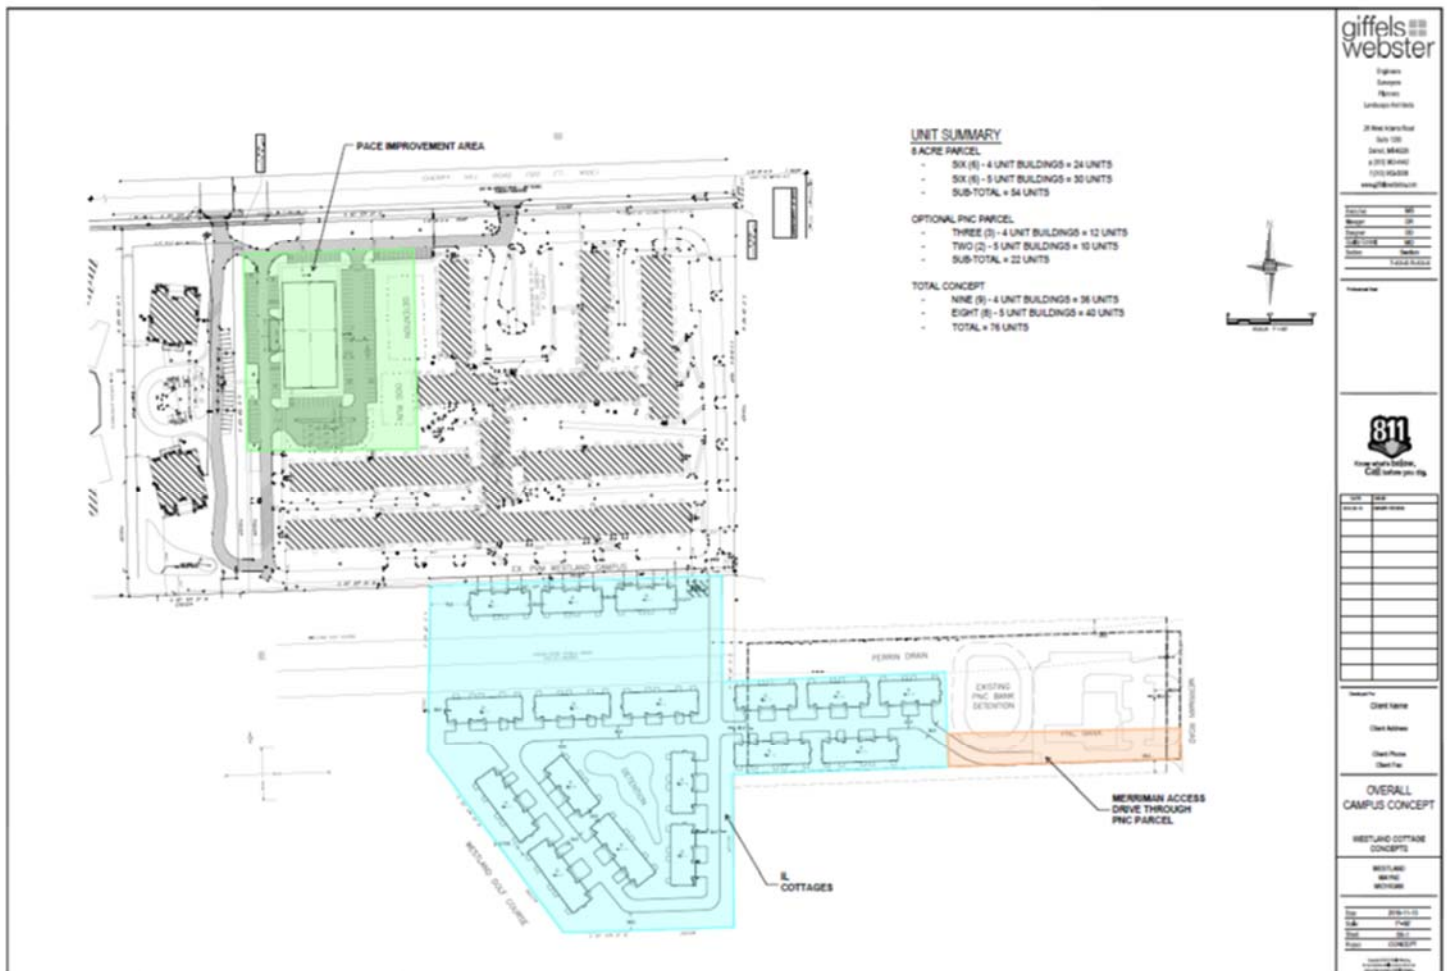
EXHIBIT III – SITE PLAN OF VILLAGE OF WESTLAND PROJECT – ALTERNATIVE 2
